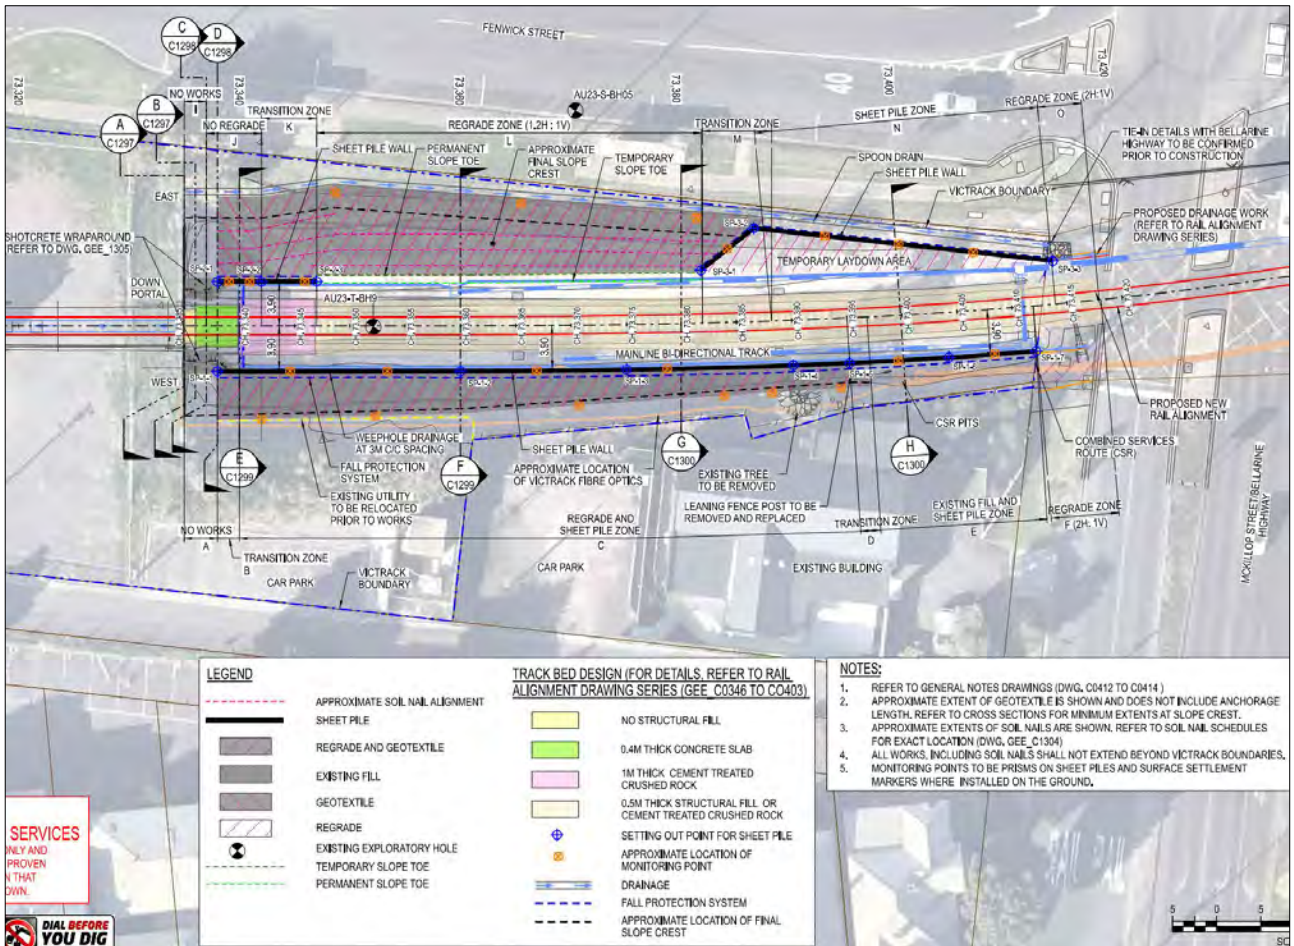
PLAN SHOWING RETAINING WORKS AT DOWN END PORTAL. (SOURCE: AURECON/VLINE)
